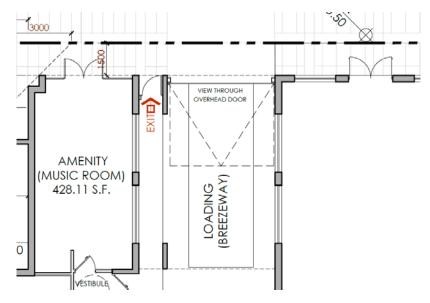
Drawing A2-04 Level 1 – Loading Area (Breezeway) detail
